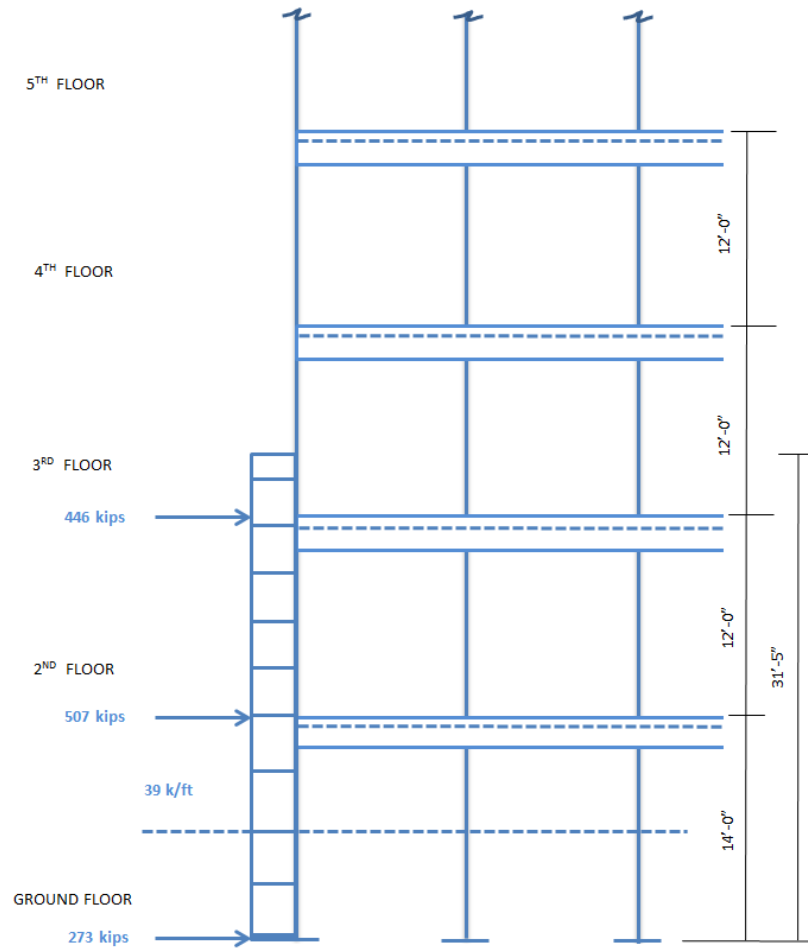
LC3 Tsunami loads on overall Seaside office building
